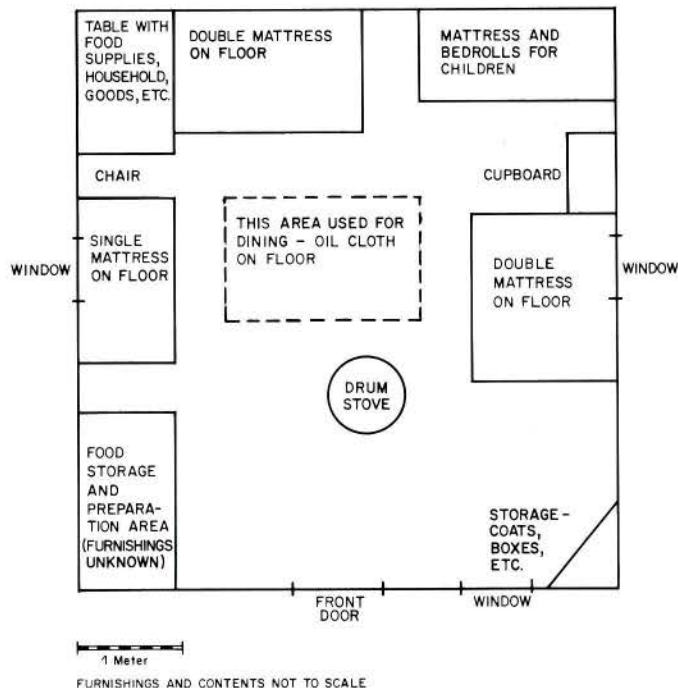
Cabin floor plan of household 3, recorded on 28 April, 1975. Twelve people were occupying the cabin.
